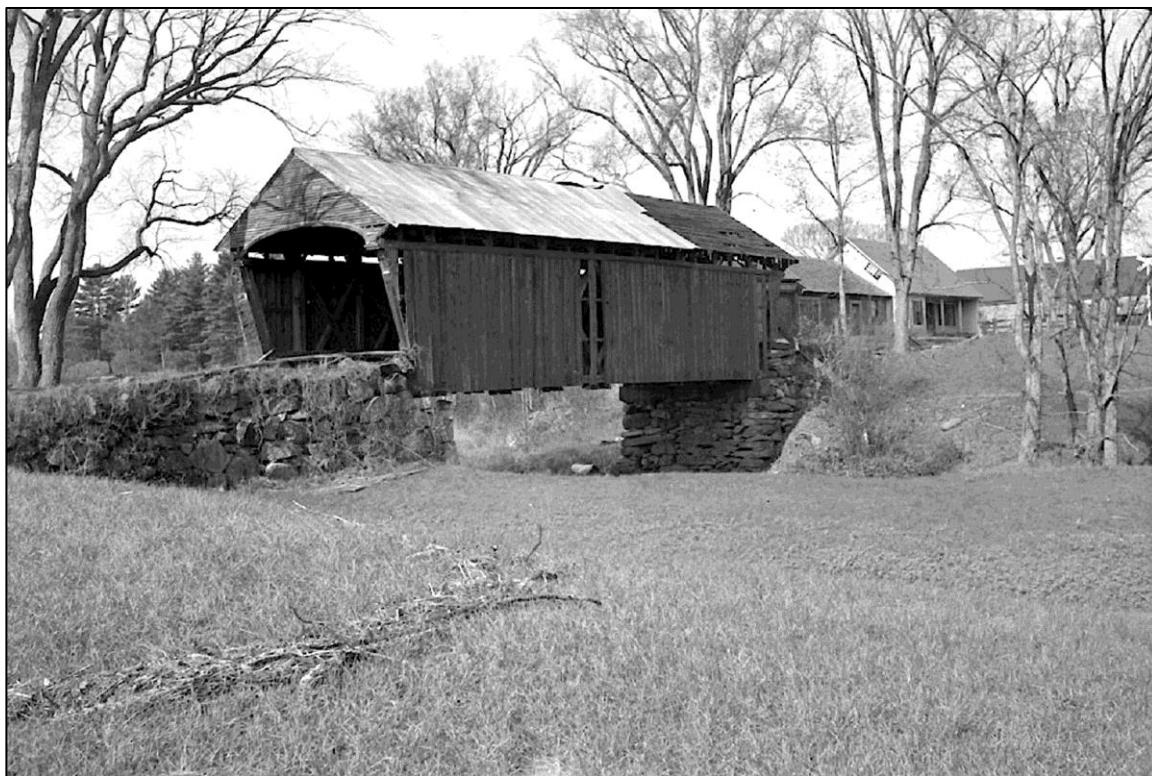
Bement Bridge, south portal and downstream (east) side, 1939, showing damage evidently from 1938 hurricane & flood. Note existing concrete repair to north abutment not present (source: Town of Bradford).
